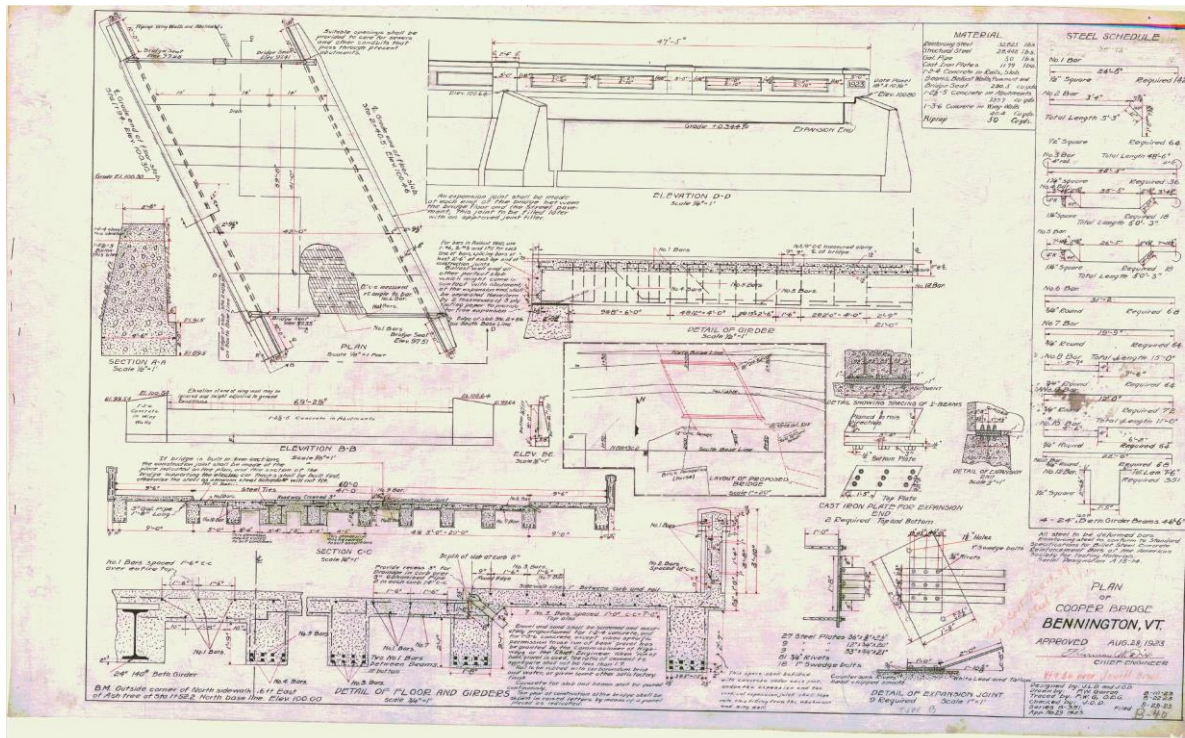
1923 Plans for Bridge No. 6 (Cooper Bridge)
